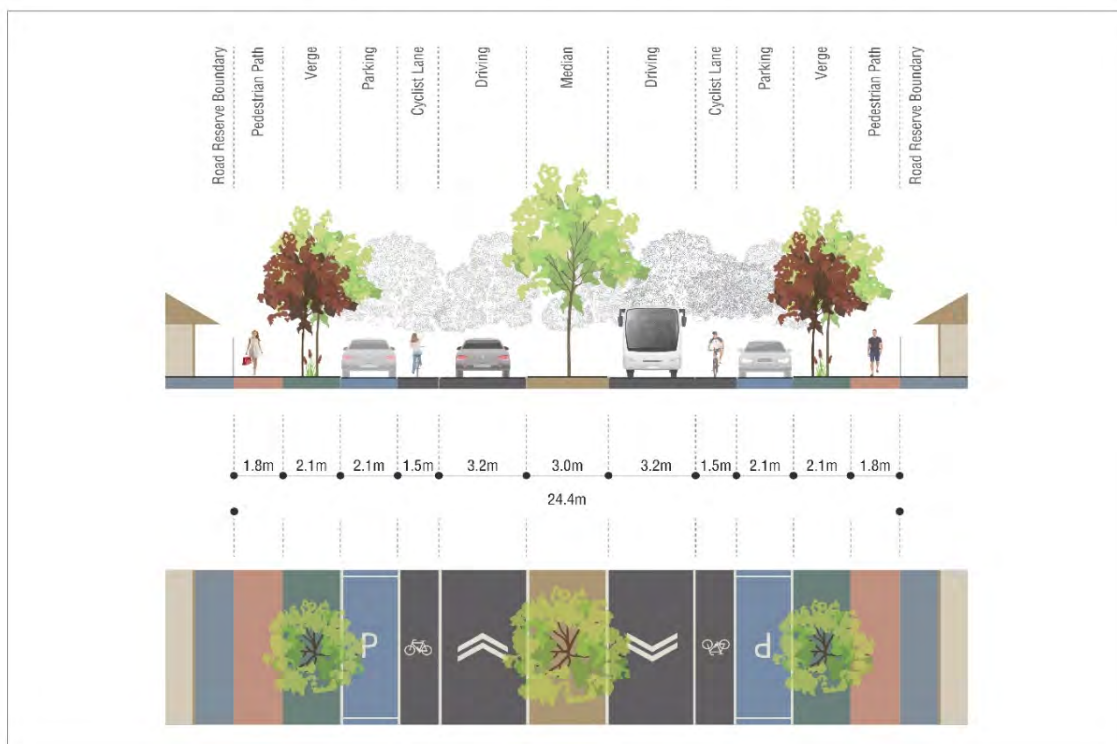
RD17 Stewart Road (East of Milner Street) Cross Section
